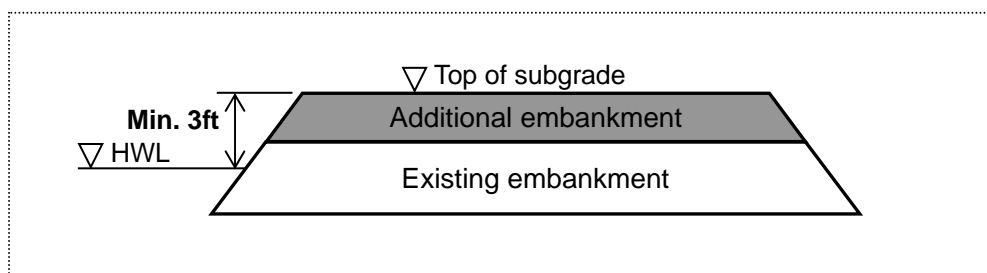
Image Cross Section of Embankment & Subgrade in PP-2
